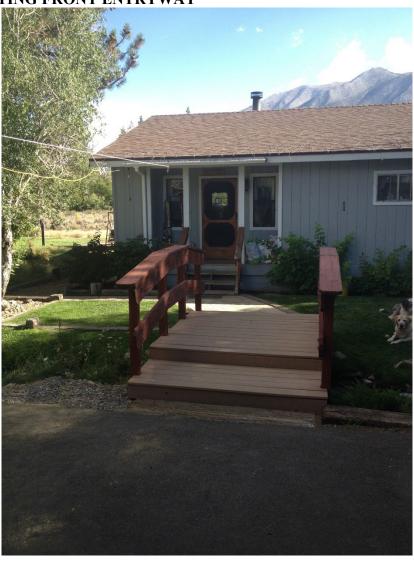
shows the current front porch. The wooden stairs will be removed and replaced with an enclosed entryway. The footbridge shown in the foreground provides walking access across the stream from the street and garage.
